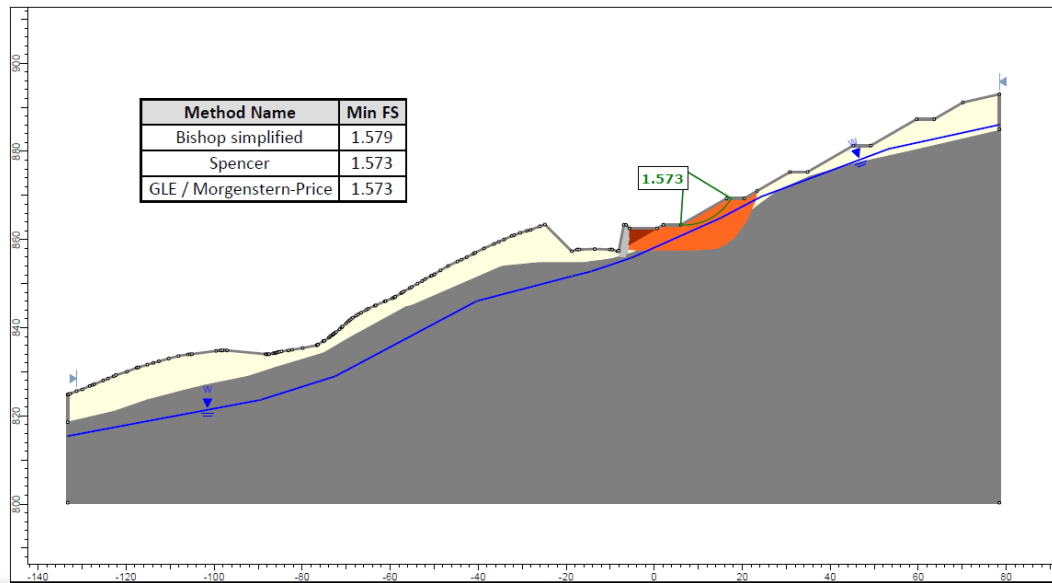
Final remedial design for Section A-A incorporating a 30° slope with a stone masonry retaining wall, achieving target safety factors under static conditions (FS=1.573)
